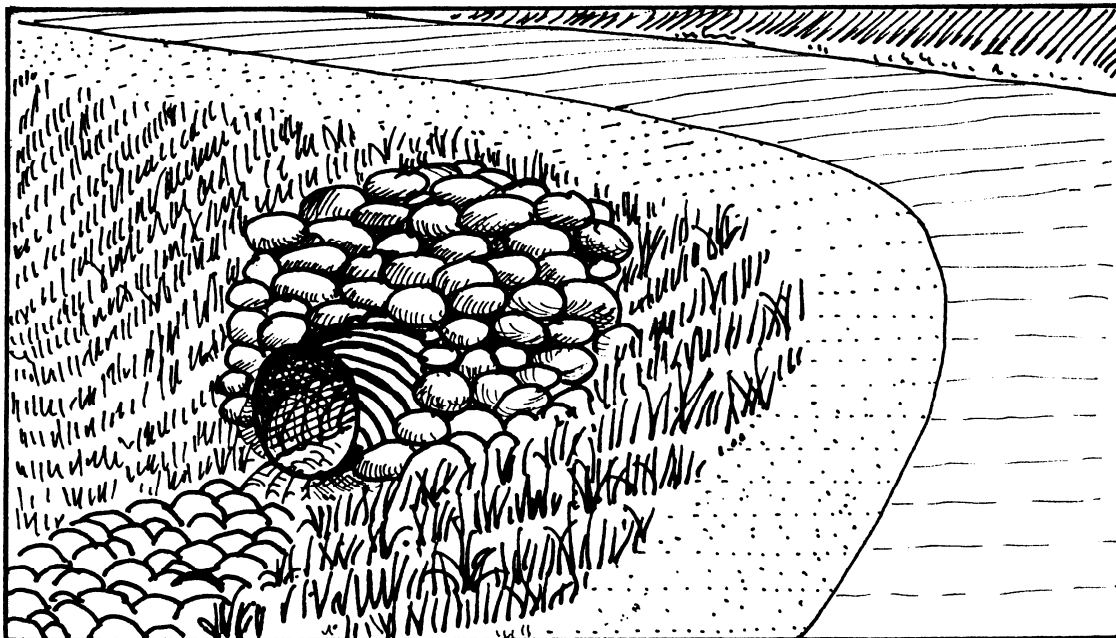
Rock headers on culvert outlet: headers (on 2:1 slope) at both ends prevent erosion.
